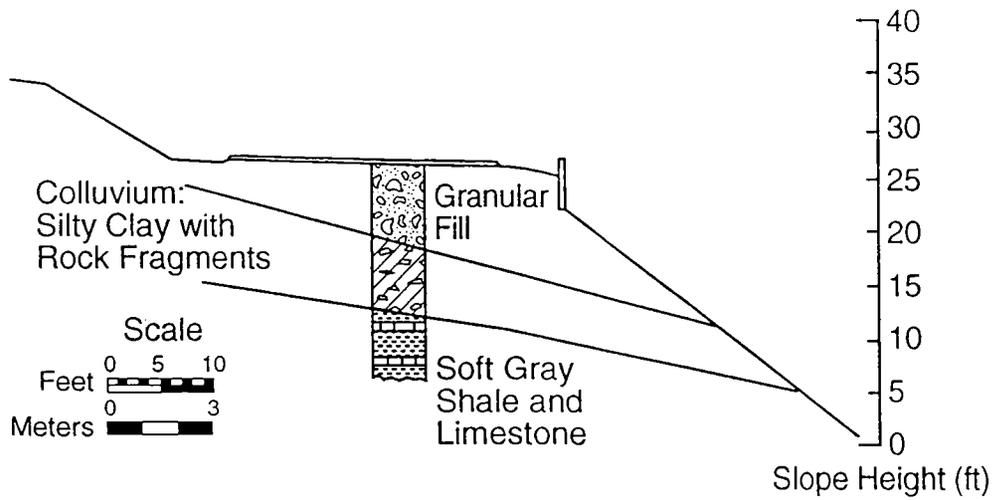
Slope geometry and soil profile at the West Fork Road site.
